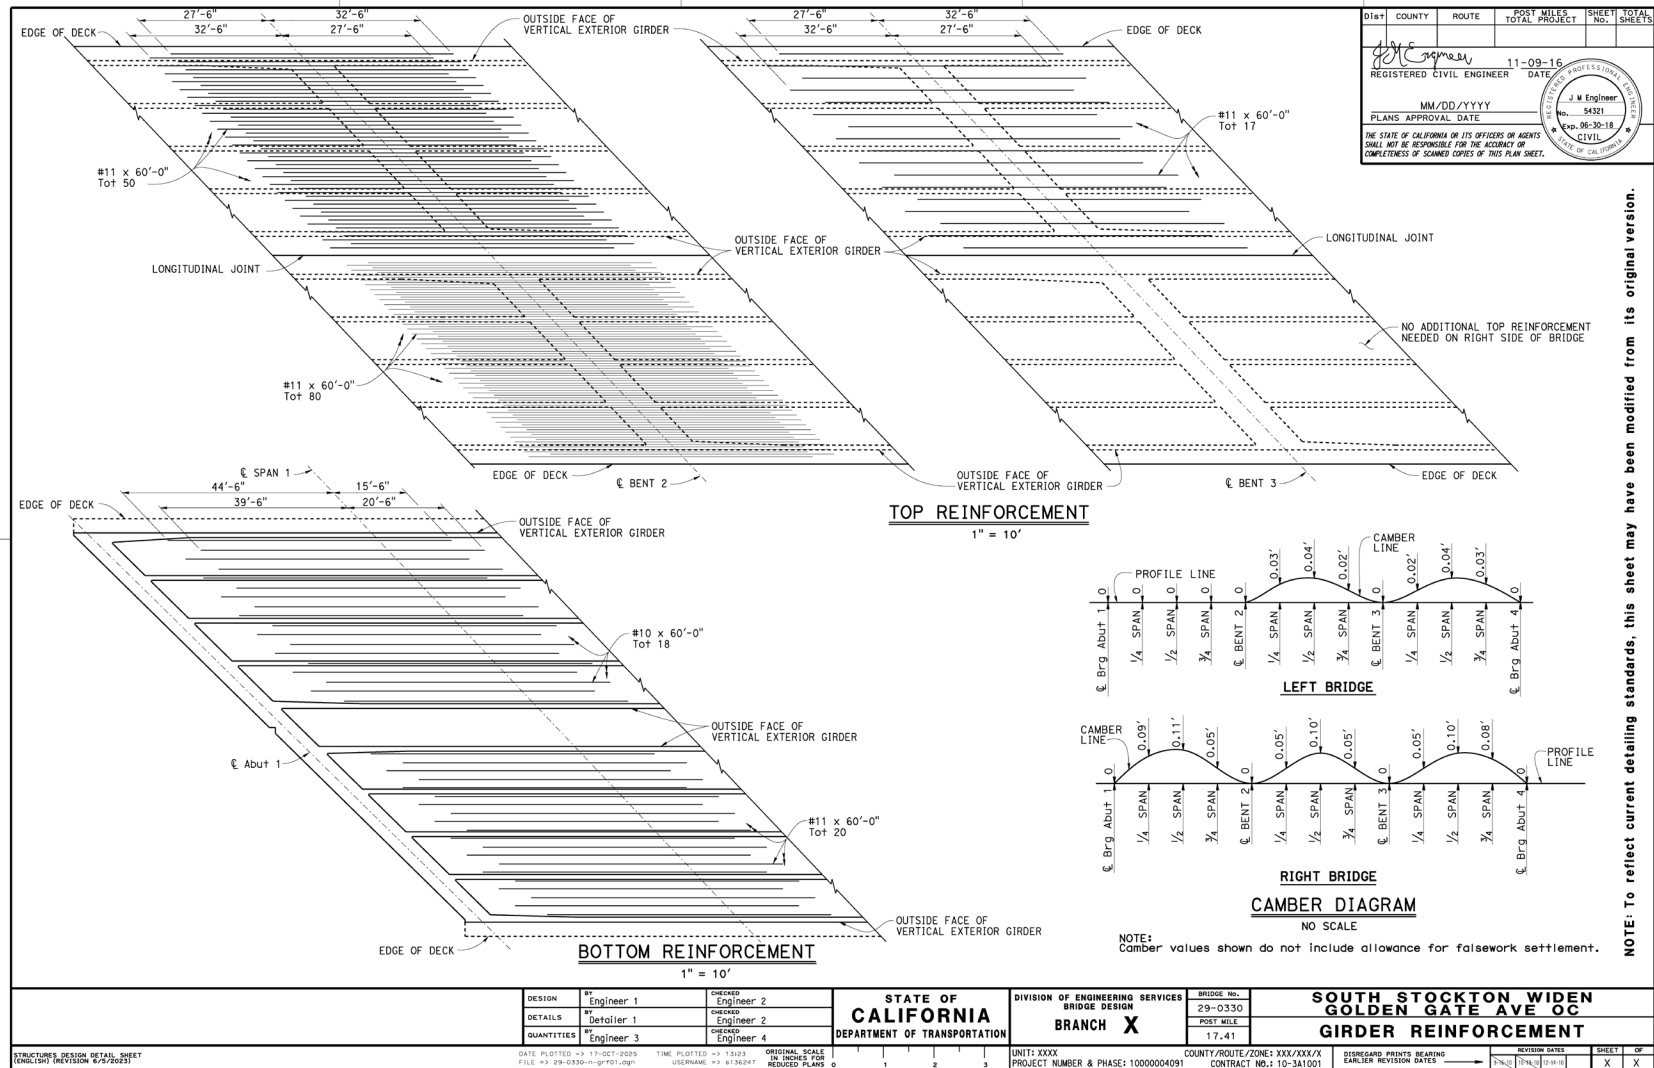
A.A.1 Girder Reinforcement Detailing Example 1
